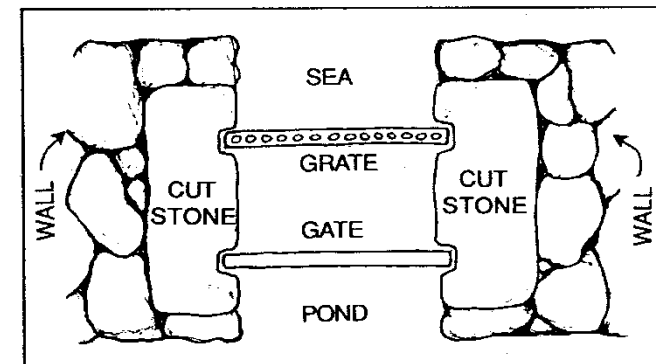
Drawing of typical mākāhā area in fishpond wall. (Modified from Kelly, 1975)
